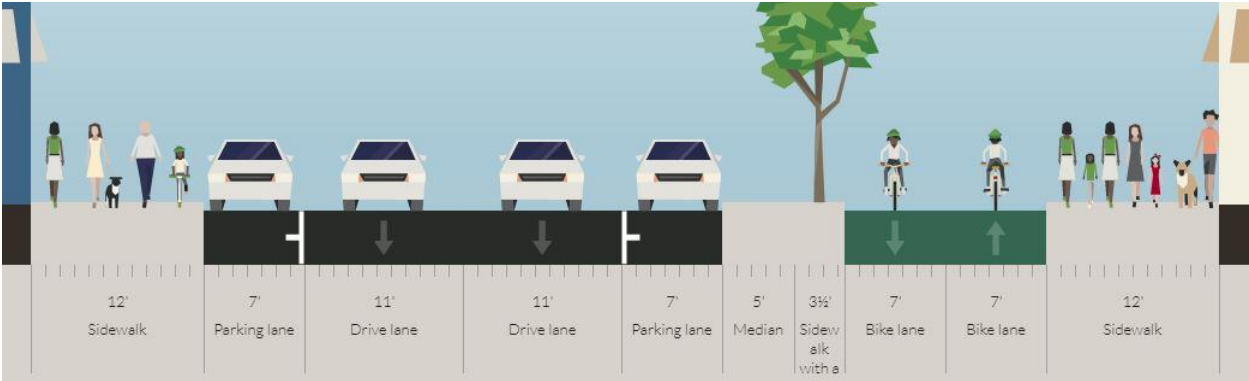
Typical Cross Section of Howard Street between 11th and 5th streets, looking east
